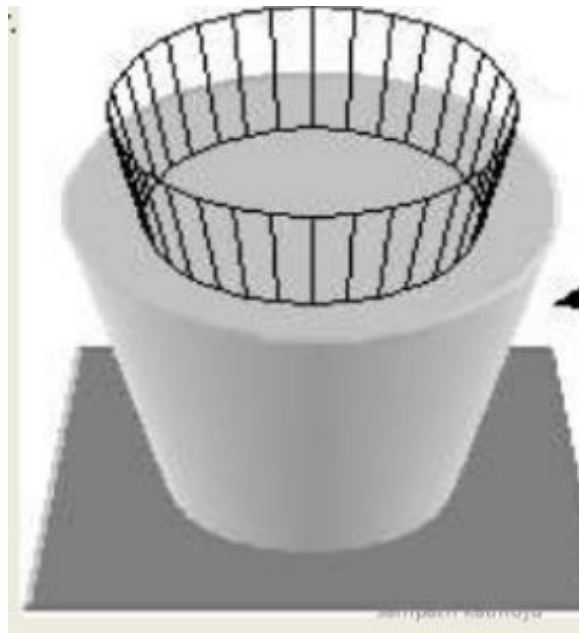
Cylinders Foundation (Bowels, 1996)
